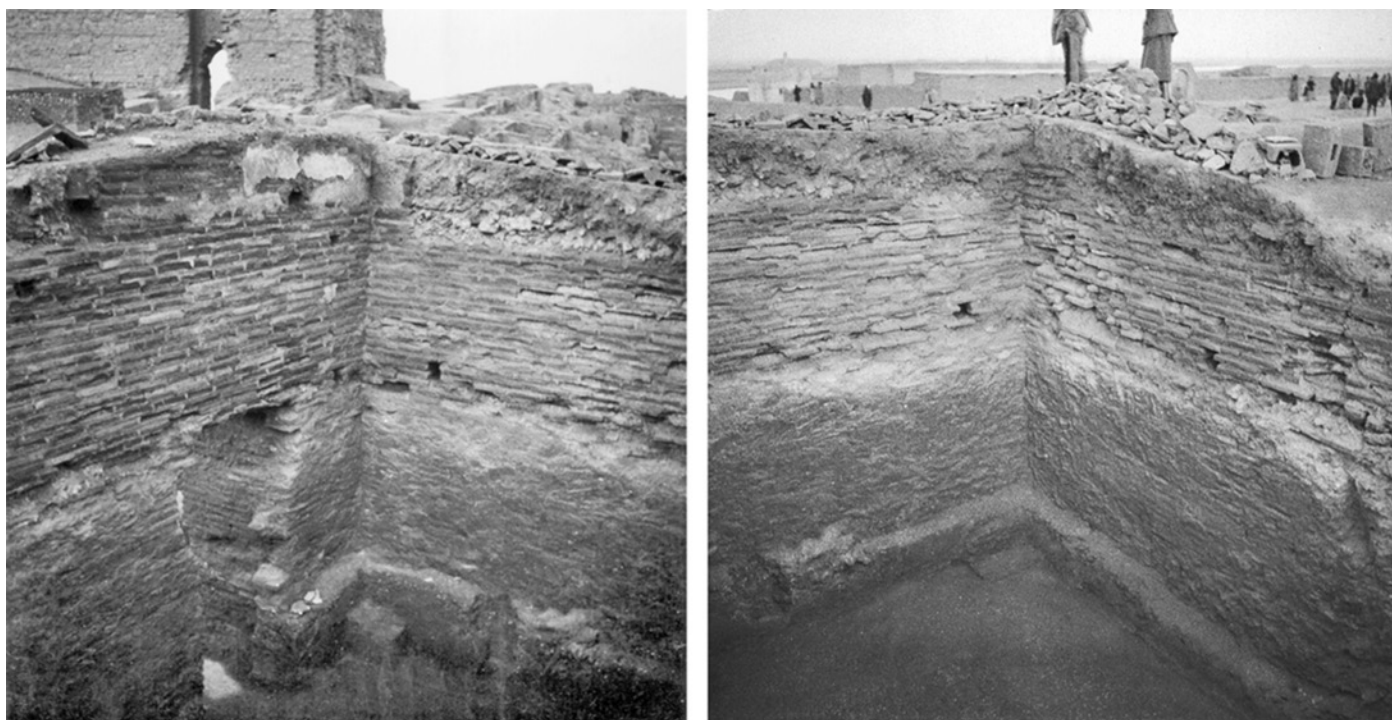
C3 bath room 3 E side showing 'ledge' (*tubuli*?) and wall holes.
